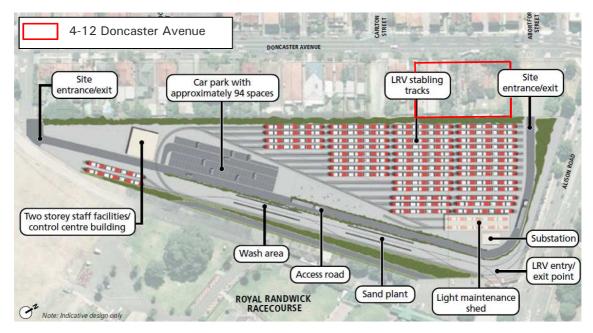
4-12 Doncaster Avenue in relation to the proposed Randwick stabling facility (source: EIS page 5-70)
